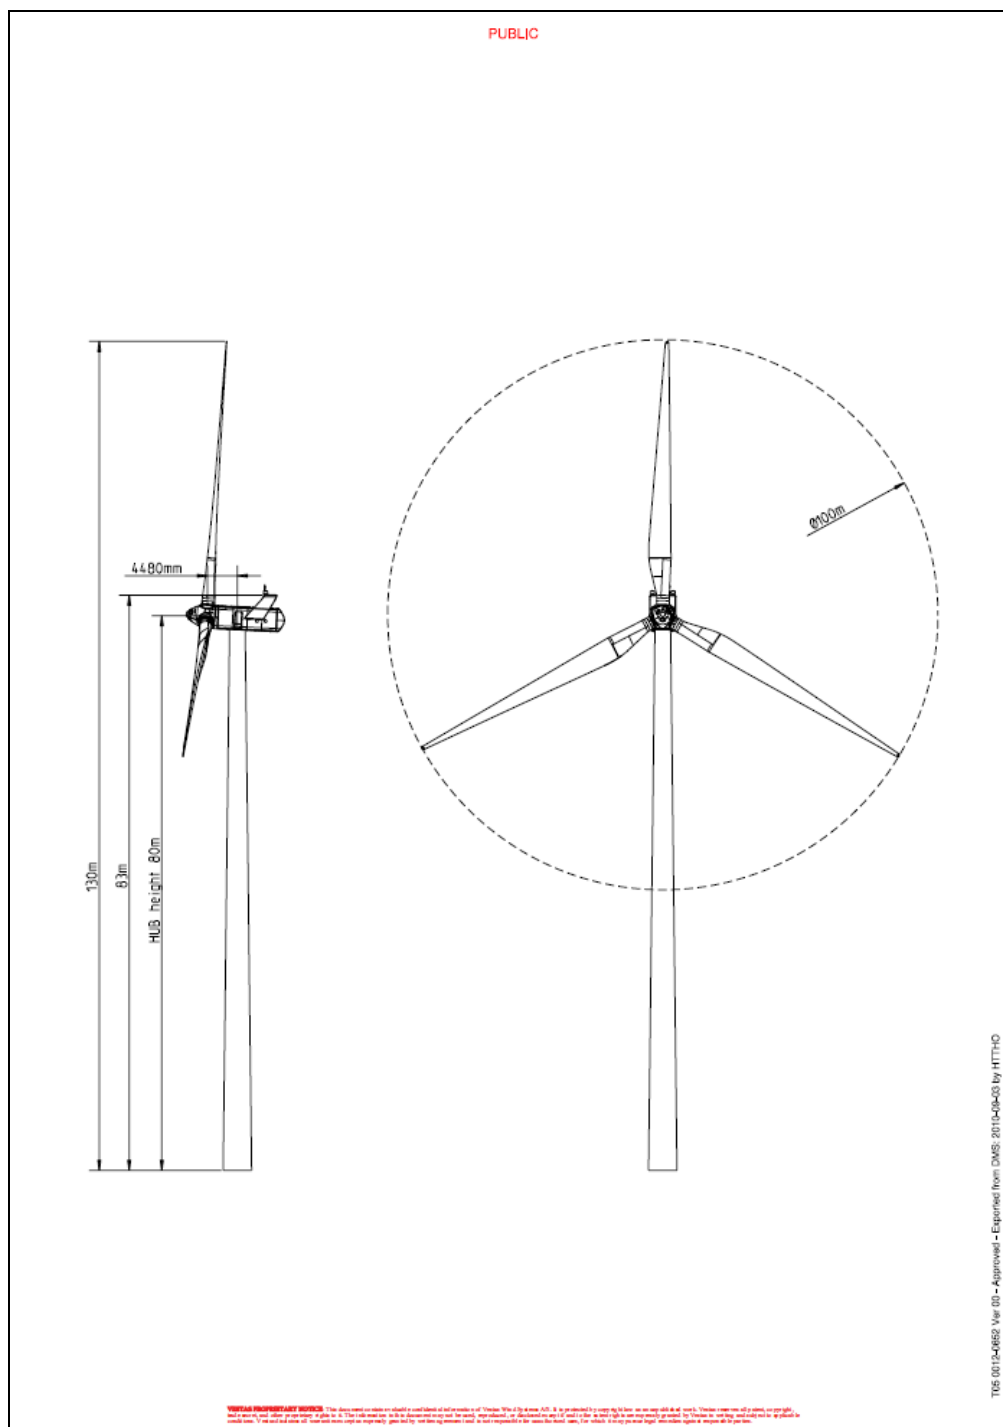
Turbine Drawing Showing Rotor Plane Offset
